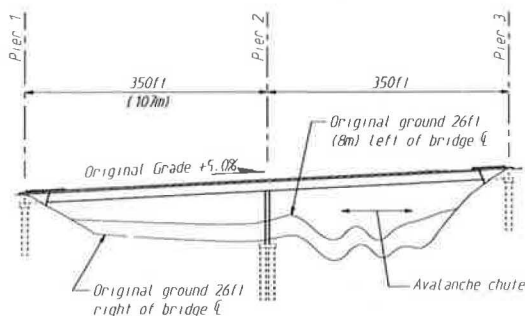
Elevation of Franklin Falls Bridge before jacking.
